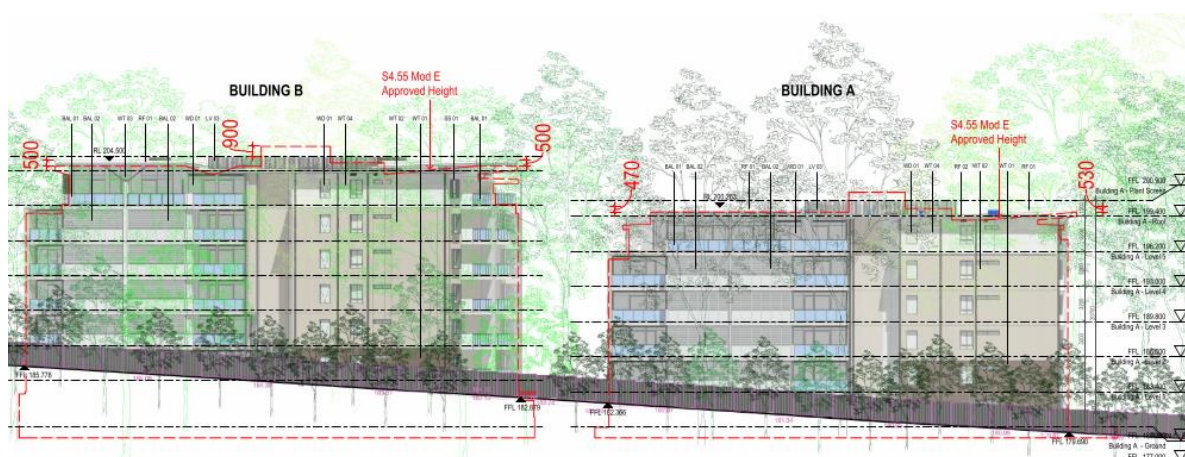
Building A & B - East Elevation prepared by Group GSA - identified approved modified building envelope in red and elevation facing Pacific highway.
